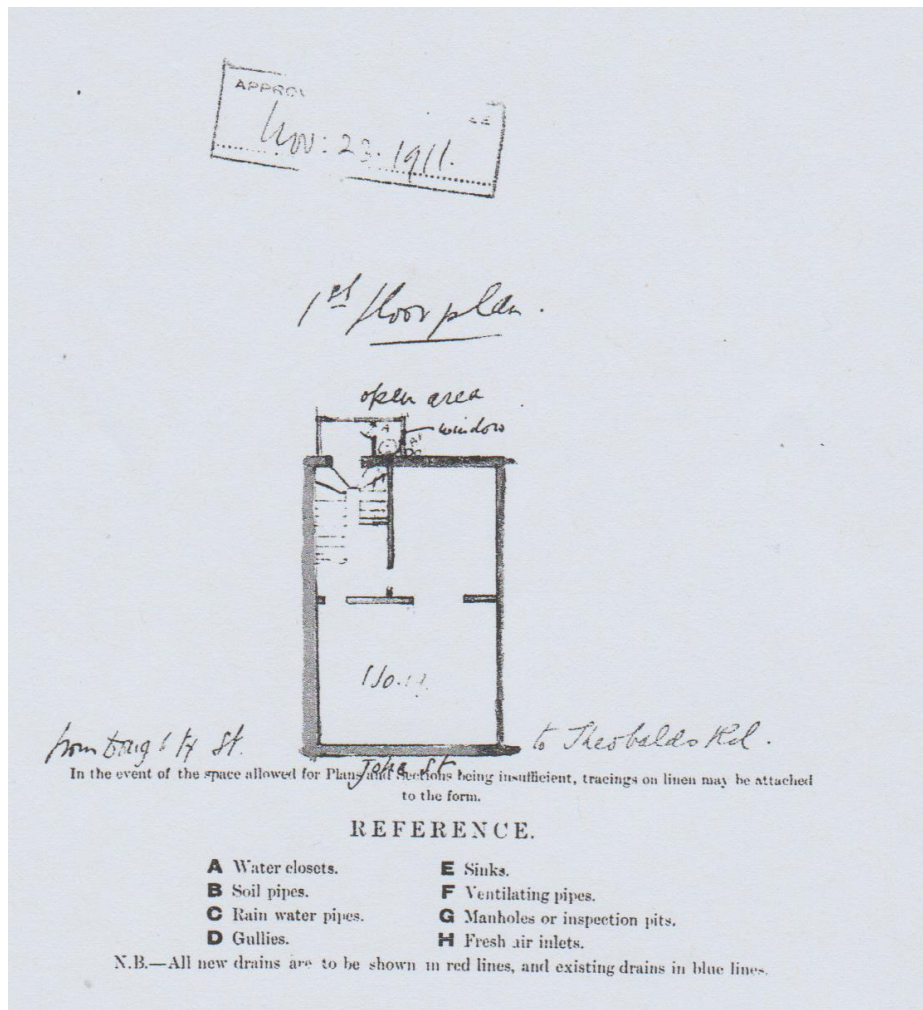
The first floor plan in 1911 (Camden Archives, drainage plans)
